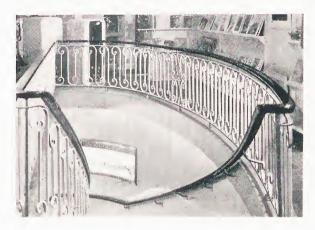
A most pleasing and distinctive stair balustrade with polished timber handrail made and erected by us to architect's design at Mates Ltd., Albury, N.S.W.
